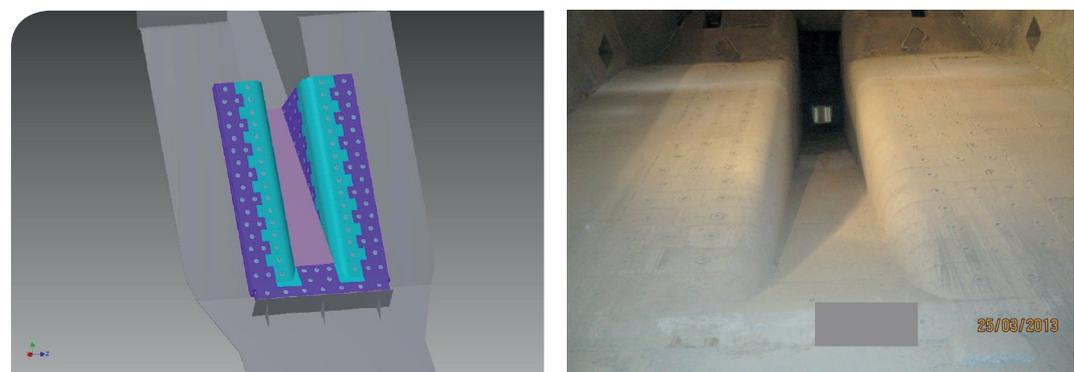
Left: drawing of a tyre chute. Right: completed tyre chute.
